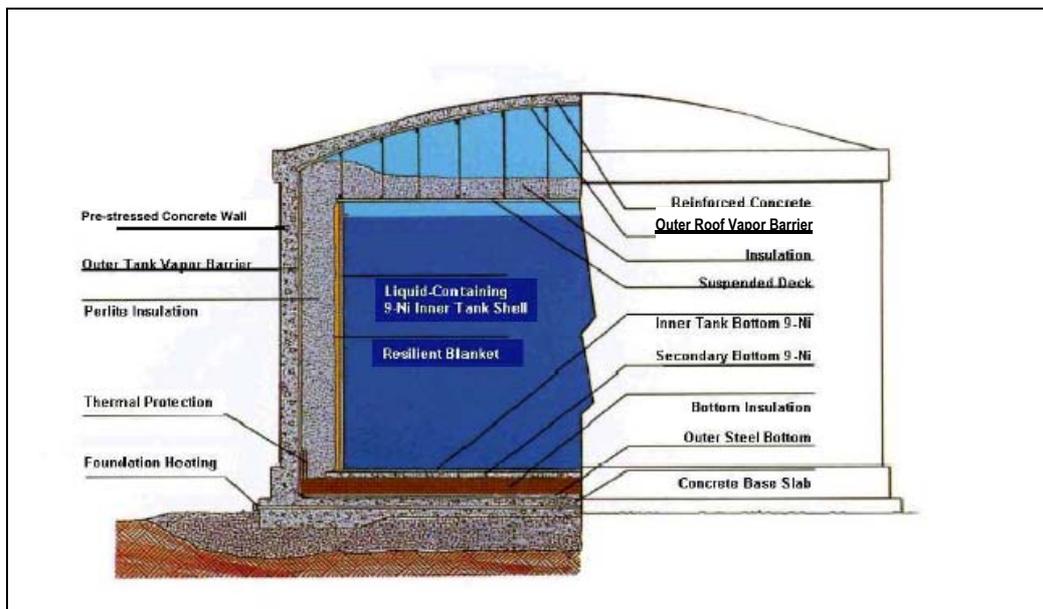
Schematic of a Full Containment LNG Storage Tank
